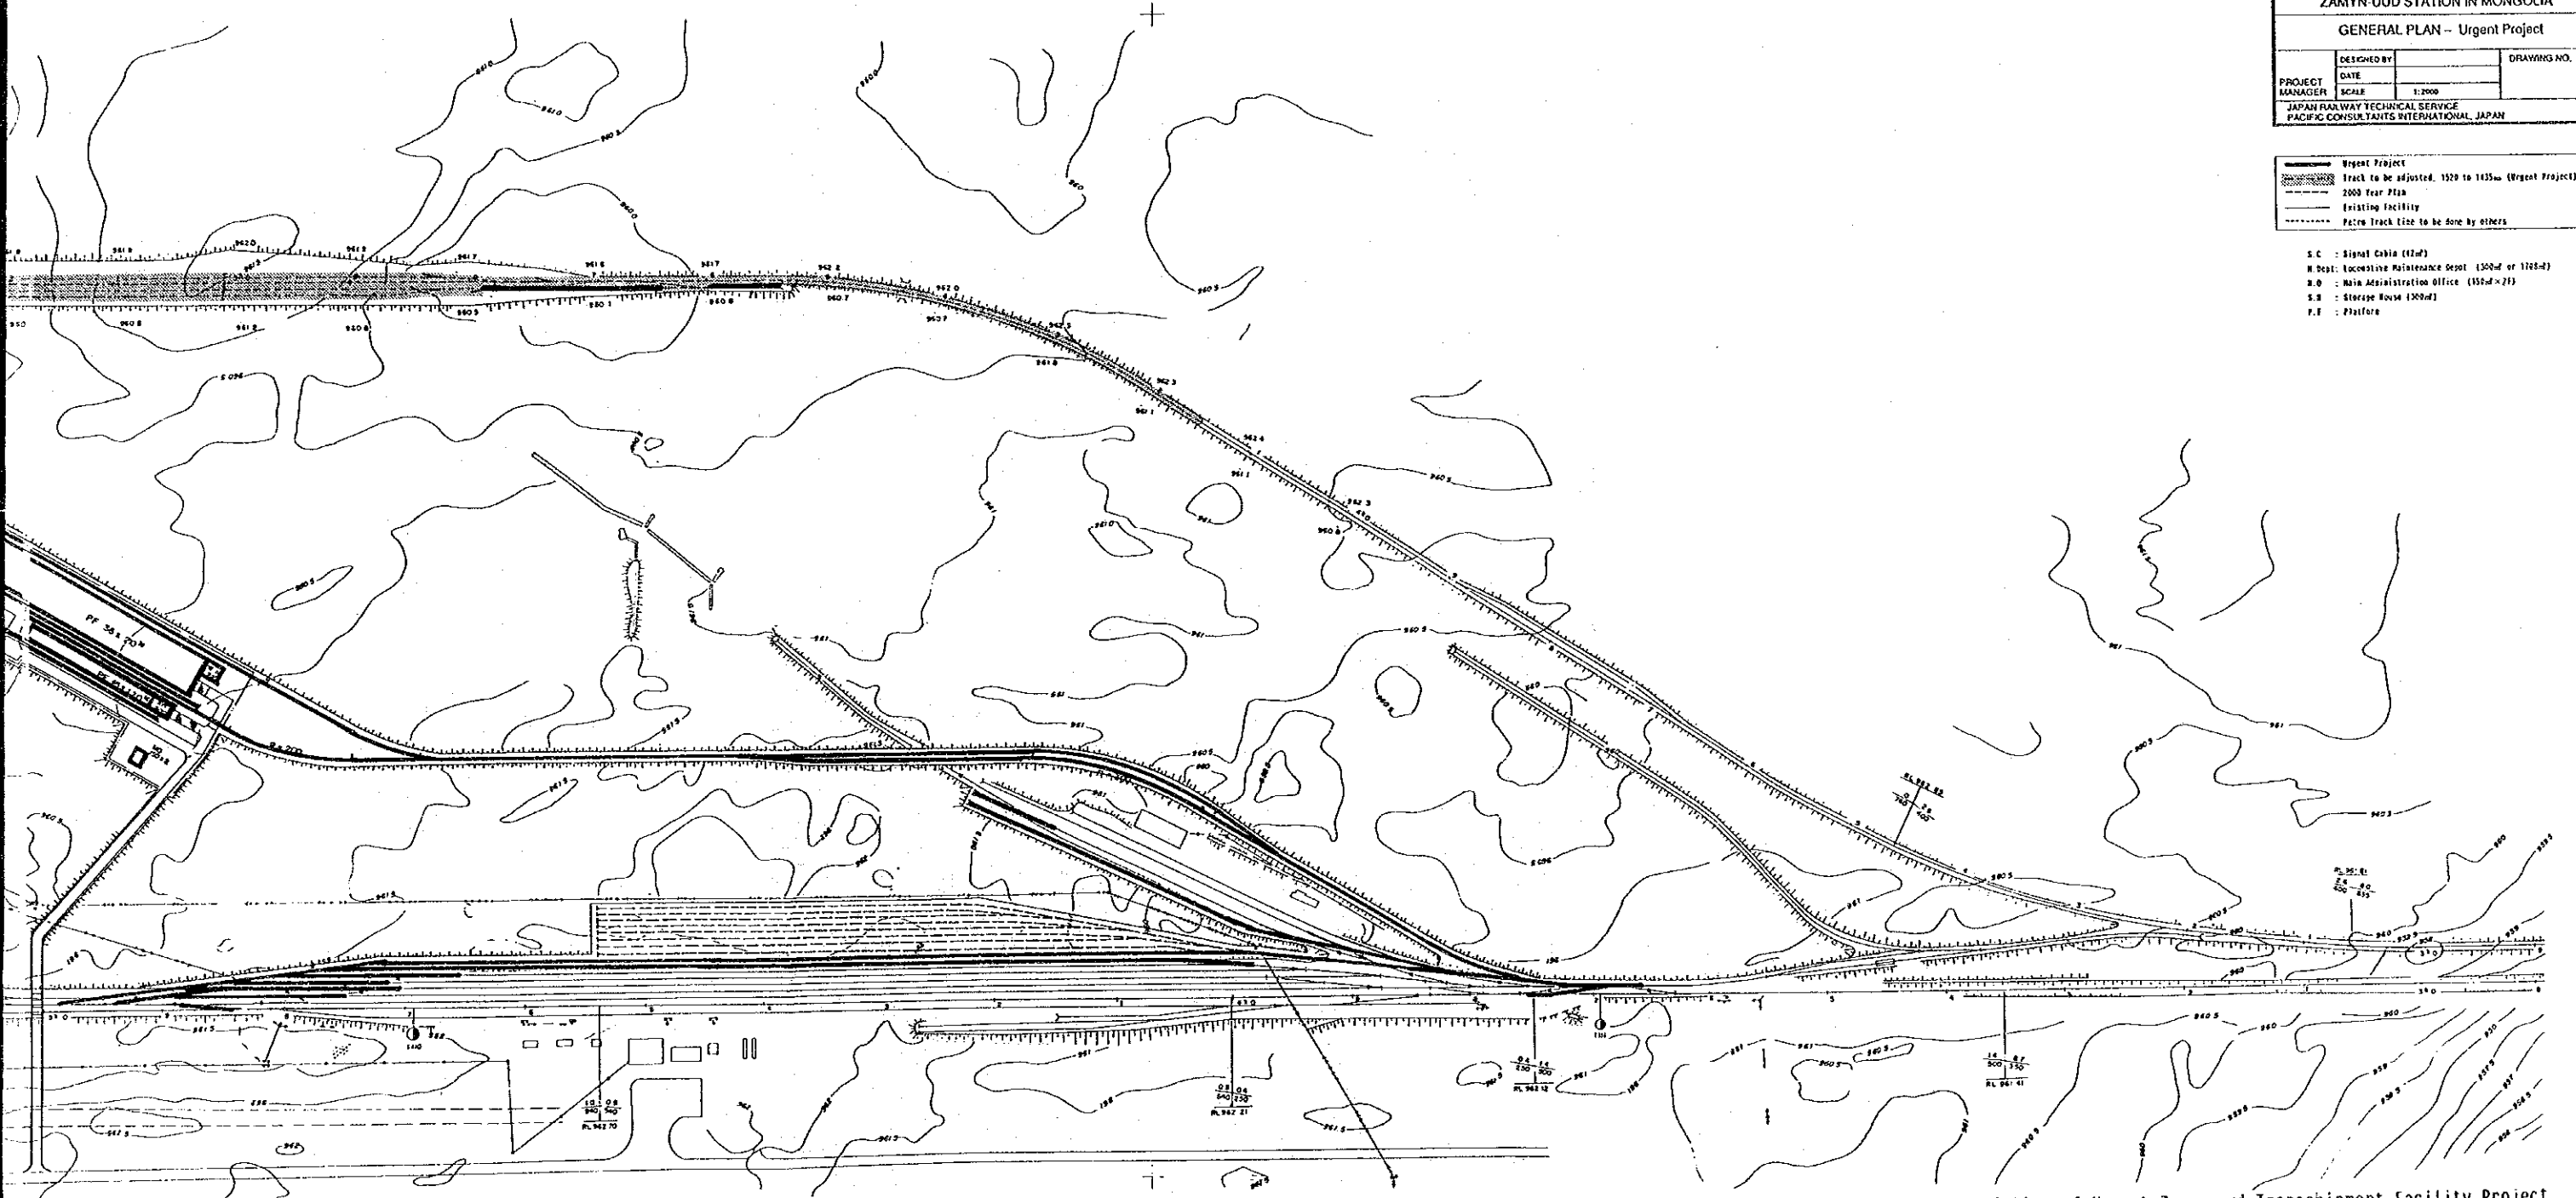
General Plan of Urgent Zamyn-uud Transshipment Facility Project
